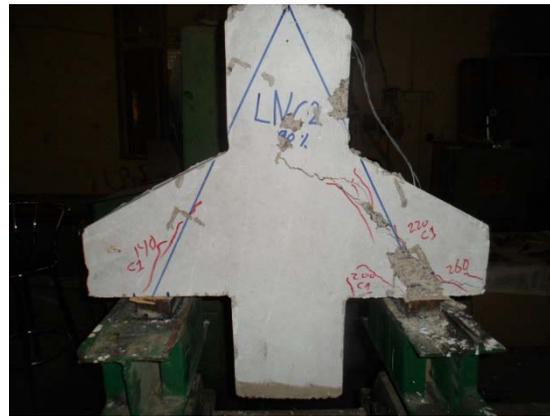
Crack pattern for corbel LNC2 (repeated load 90%) after testing
